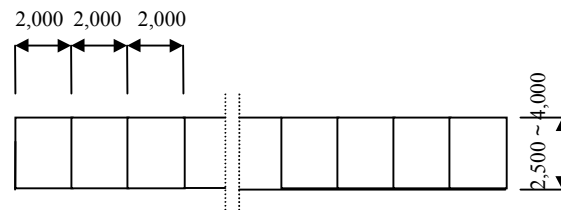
Preliminary Plan of Ticket Windows
